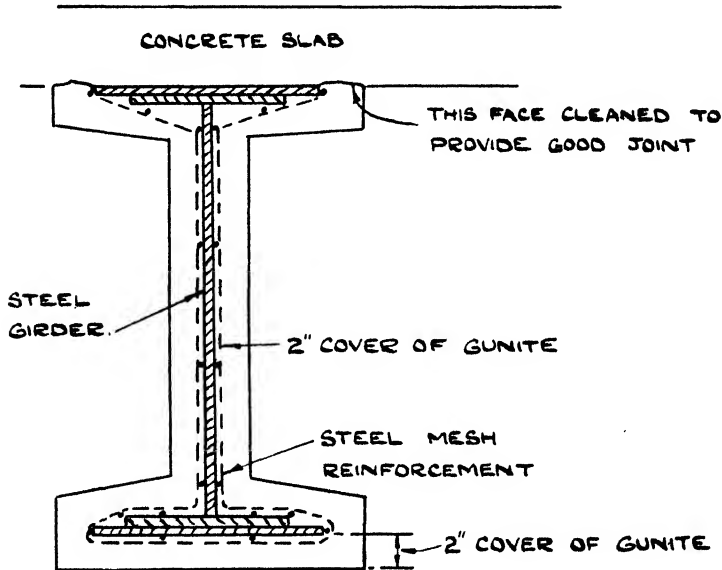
SECTION OF STEEL GIRDER SHOWING ENCASEMENT BY GUNITE
